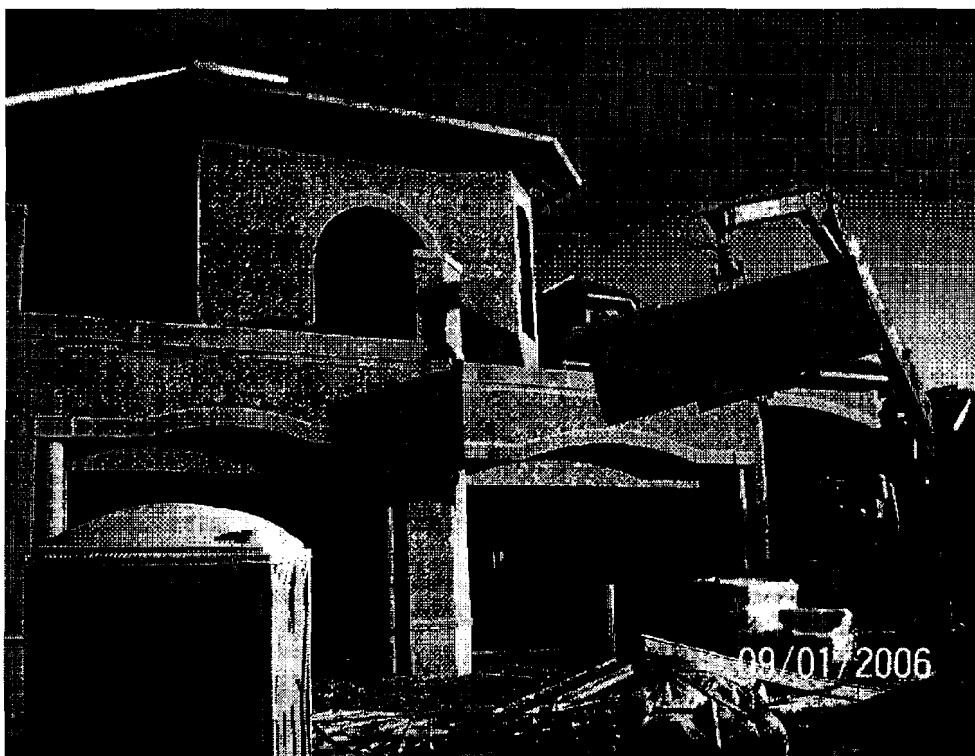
Photograph of drywall being delivered to the consumer's home on 9/1/2006.
